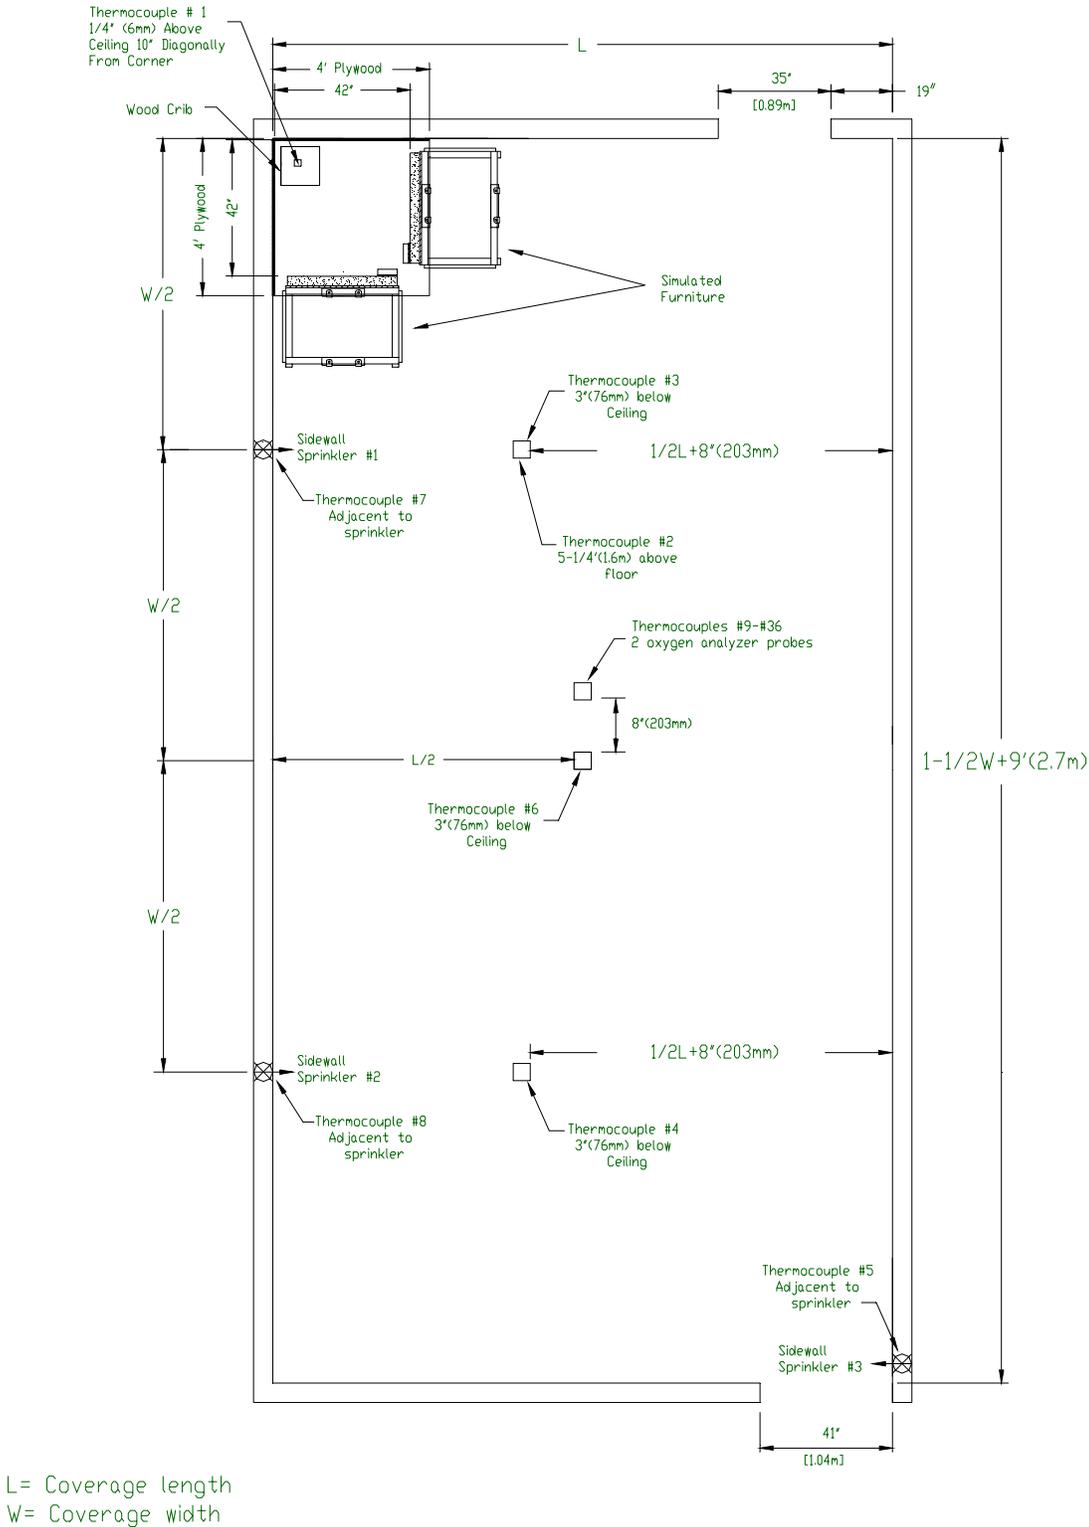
Plan view of room for Test No. 15. Horizontal sidewall sprinklers positioned on near wall with the fire source located in the corner.
